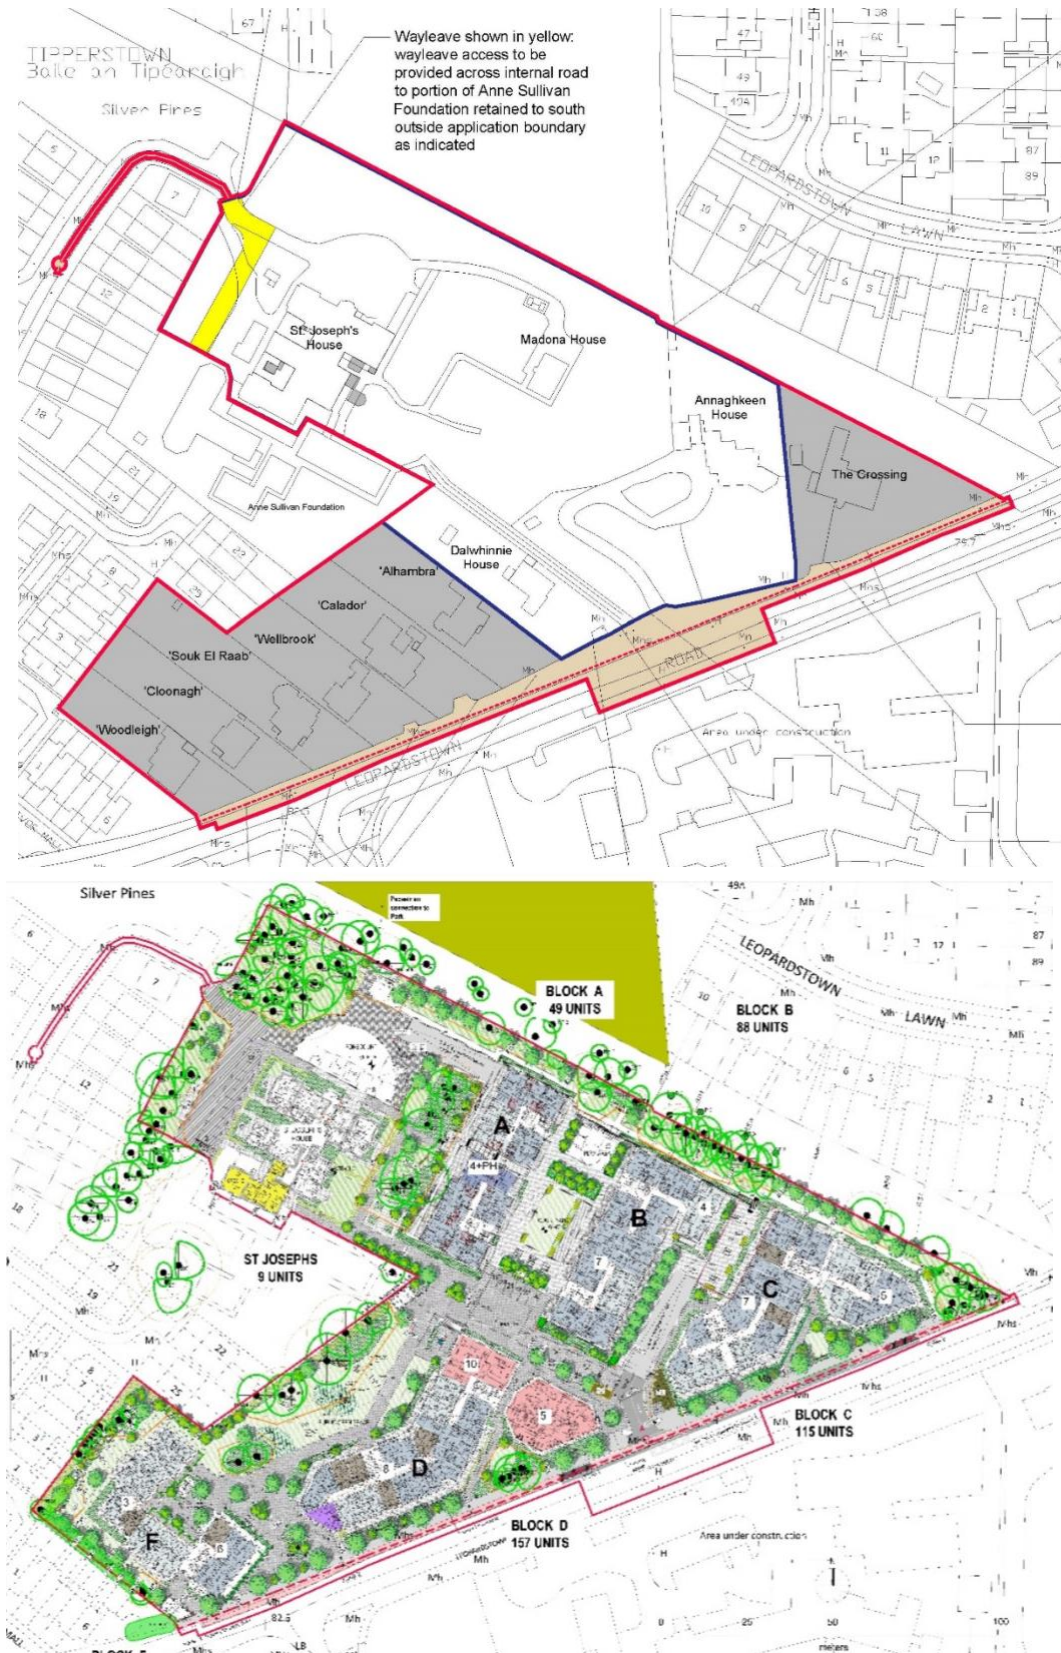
Proposed development site (top, outlined in red) and proposed development (bottom)
